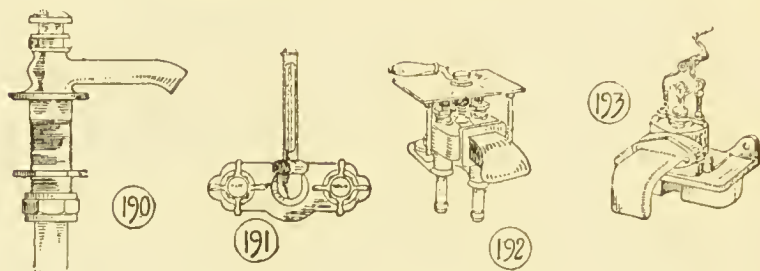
represents a section of a clear-way wheel valve, which is useful in connecting fittings where the pressure is low and it is desirable that the valve should not check the force of the supply. Fig. 189 is a section of a quick-turn full-way valve, the full-way being obtained by the extra sectional area of the body of the tap. Fig. 190 shows a spring valve, which is sometimes used for lavatory basins, where the supply of water is limited and it is desired that
